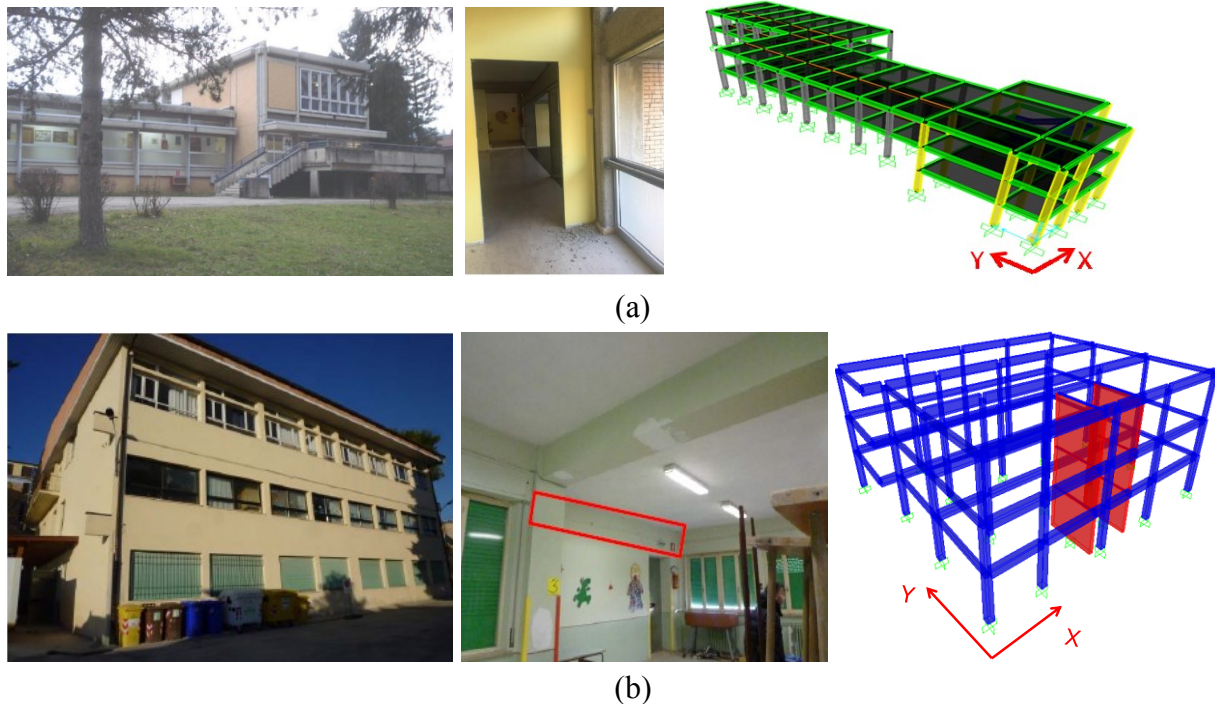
Front view and plan view of the case study school buildings: Case Study 1 (a); Case Study 2 (b).
